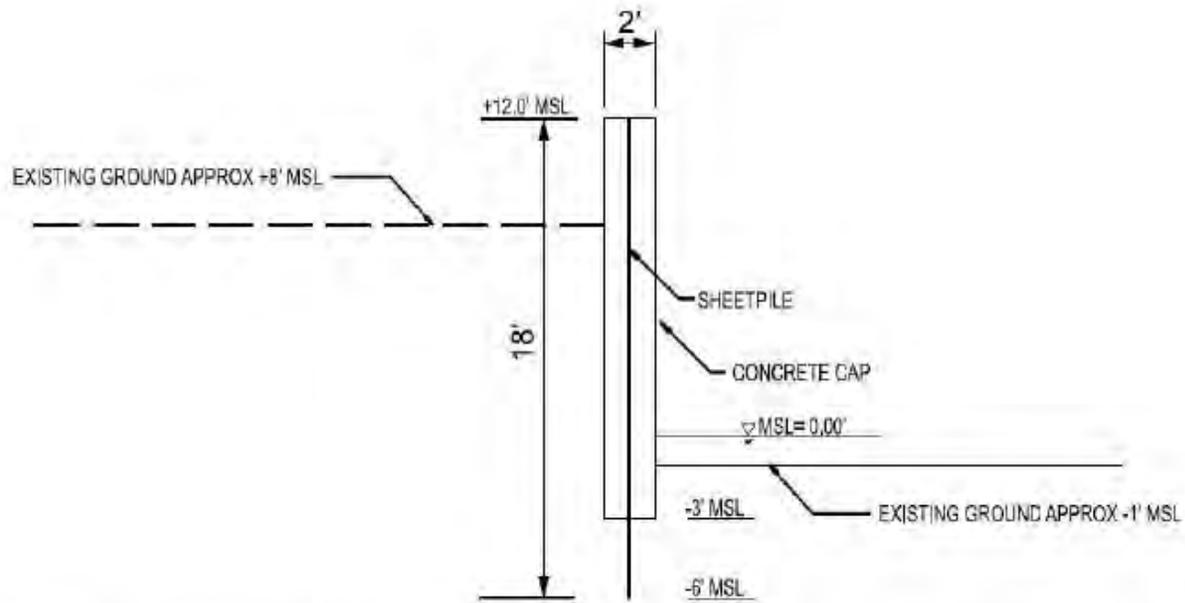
Sheetpile Seawall Alternative. Schematic of the Sheetpile Seawall alternative design. Schematic provided by Corps.
